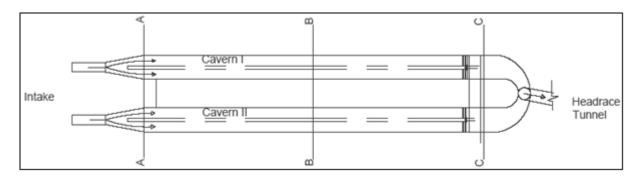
Plan Layout of settling basin cavern for alternative I, Showing different sections
